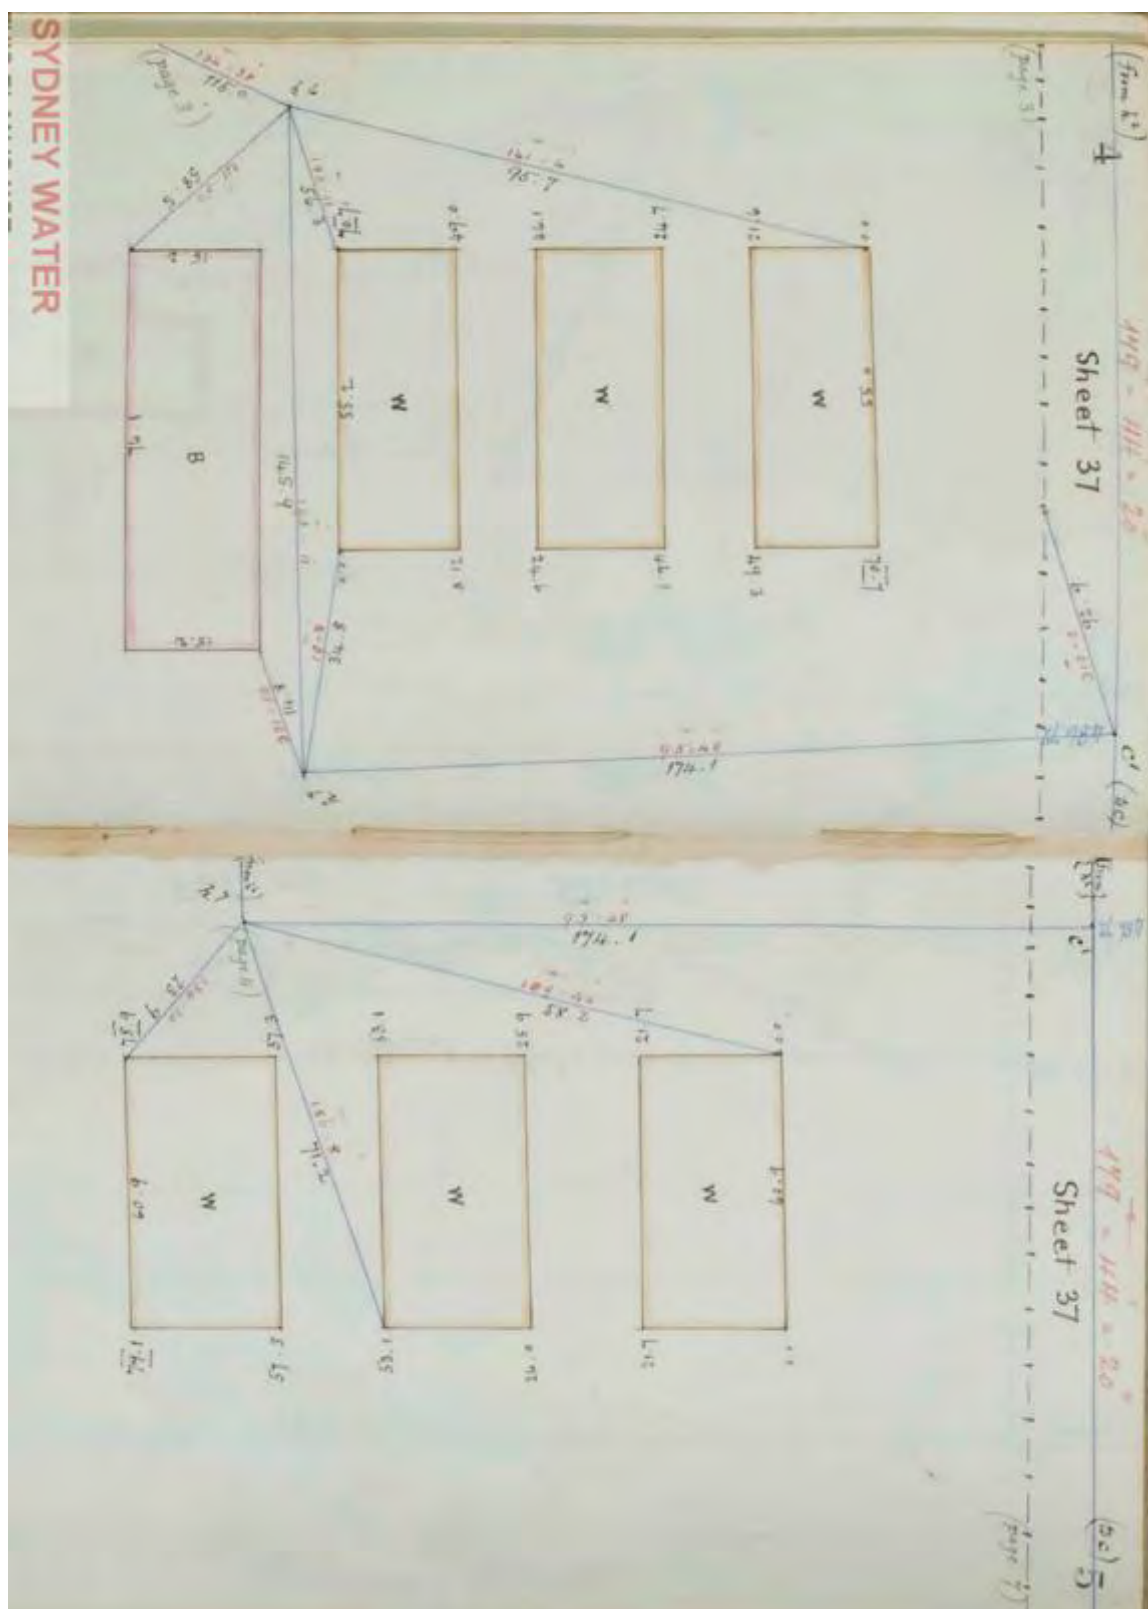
Fieldbook pages showing the timber nursery greenhouses and brick building.
